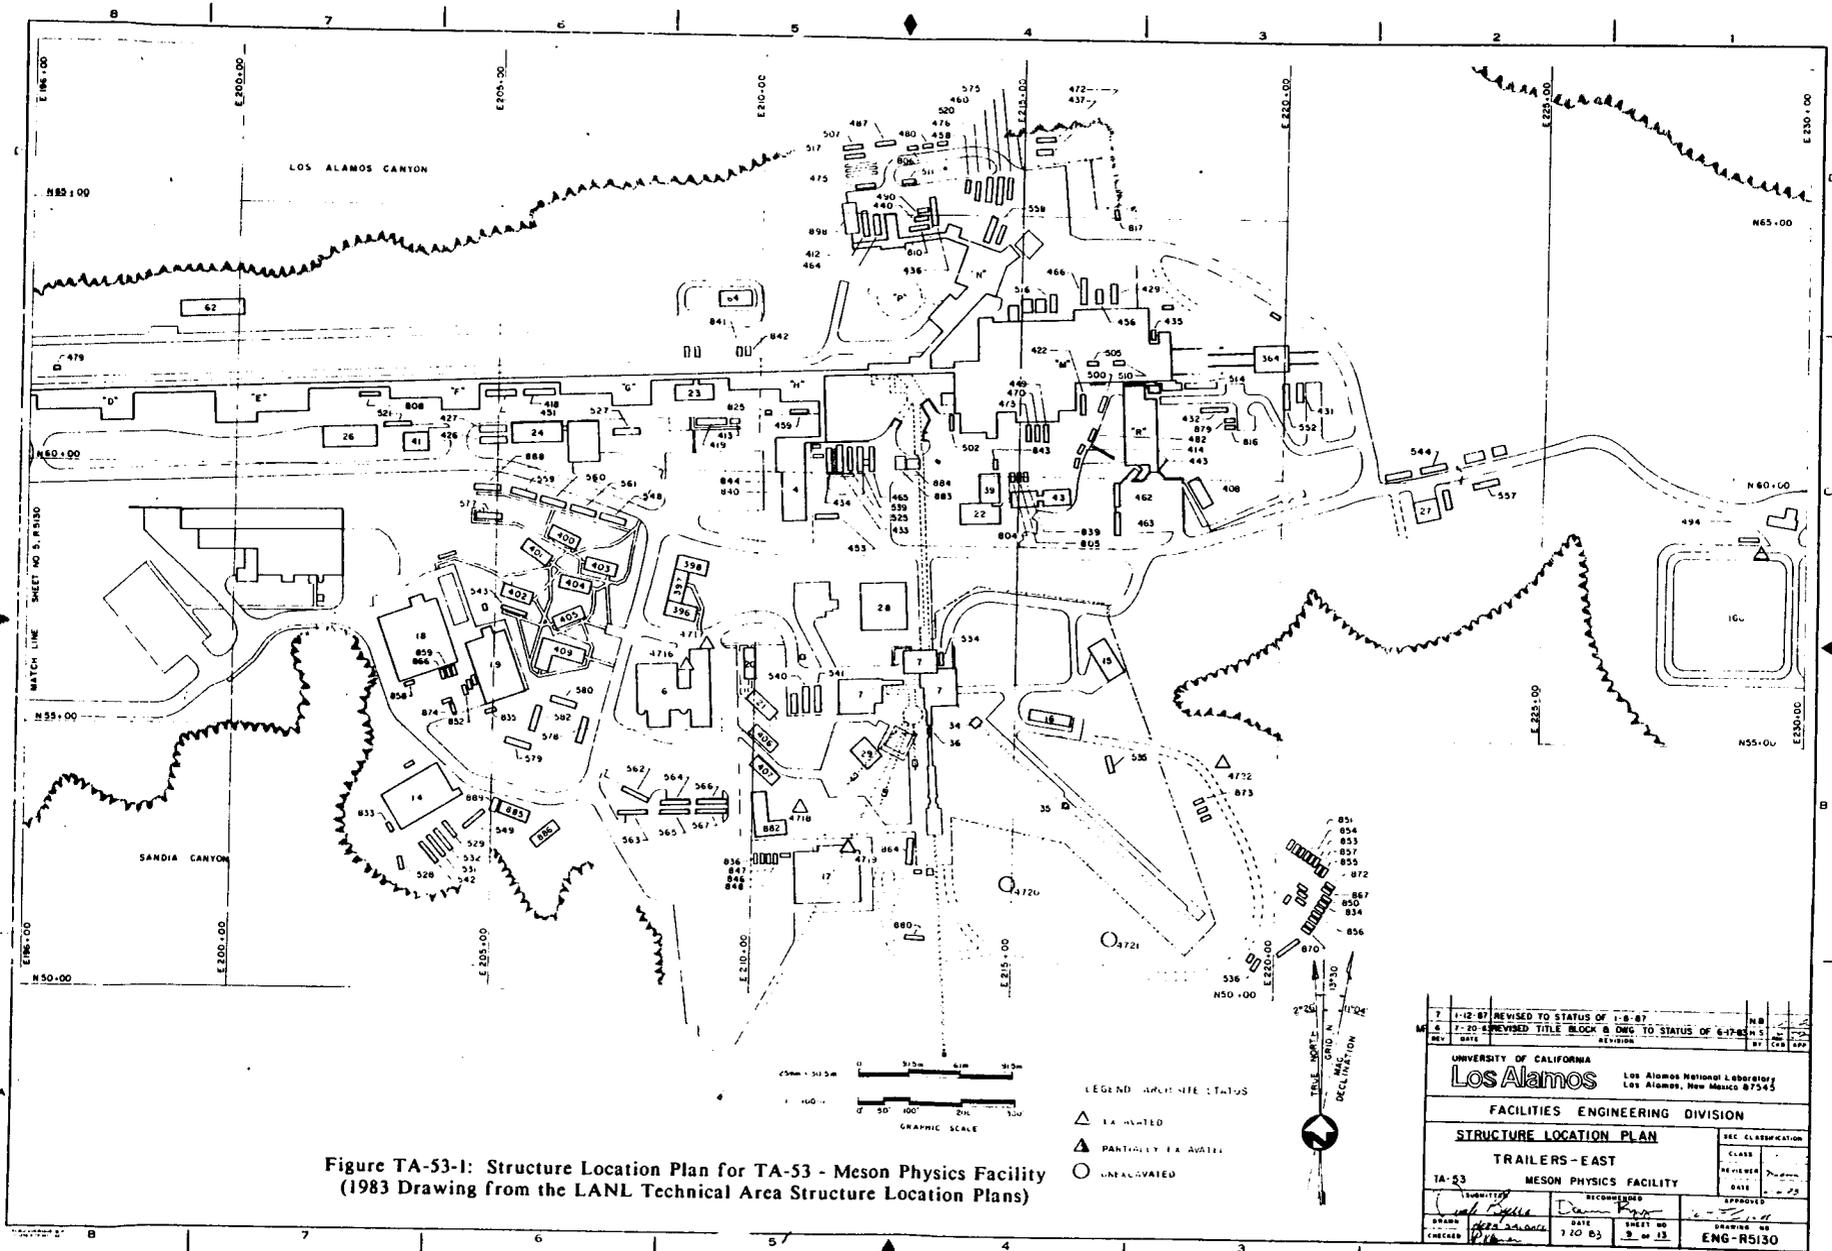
Structure Location Plan for TA-53 - Meson Physics Facility (1983 Drawing from the LANL Technical Area Structure Location Plans)
